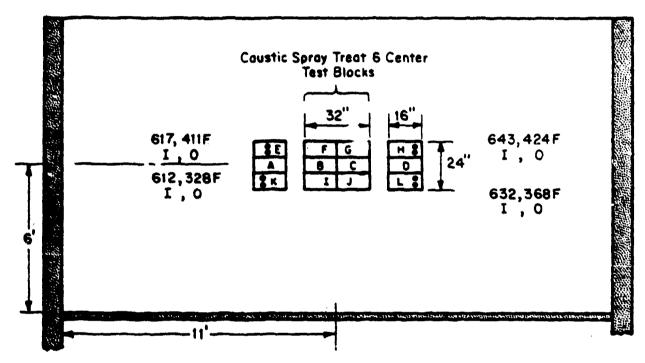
MAXIMUM INSIDE AND OUTSIDE SURFACE TEMPERATURES OF CONTAMINATED TEST CONCRETE BLOCKS IN BUILDING 4L-5 DIVIDING WALL (26 HRS) - PILOT TEST 1
